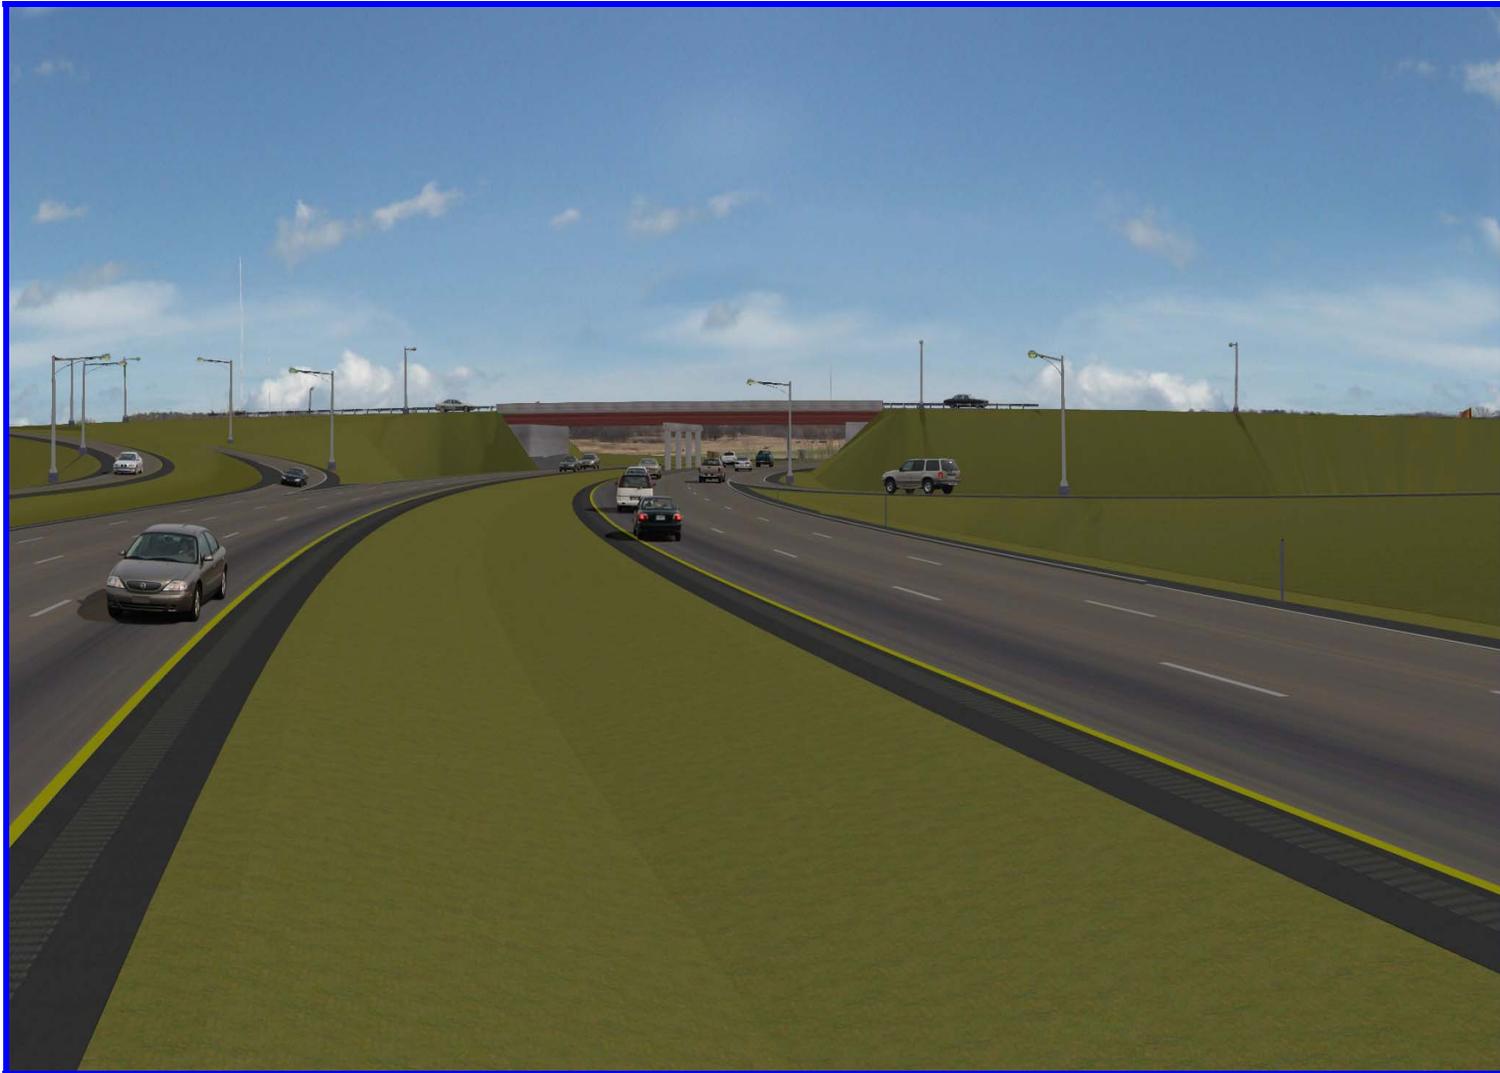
Visualization of grade-separated Kirby Parkway's approach to Walnut Grove Road from trumpet interchange
